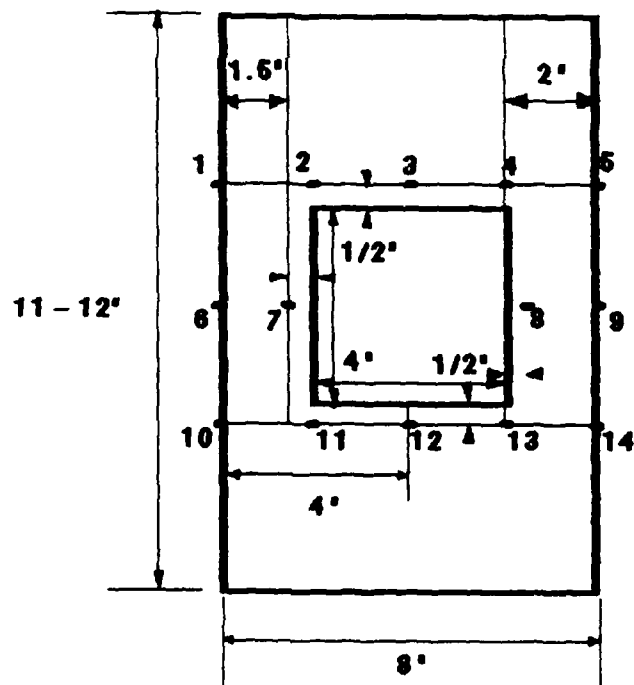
LVDT Positions, 8" Panel, 4" Cutout, Centered
